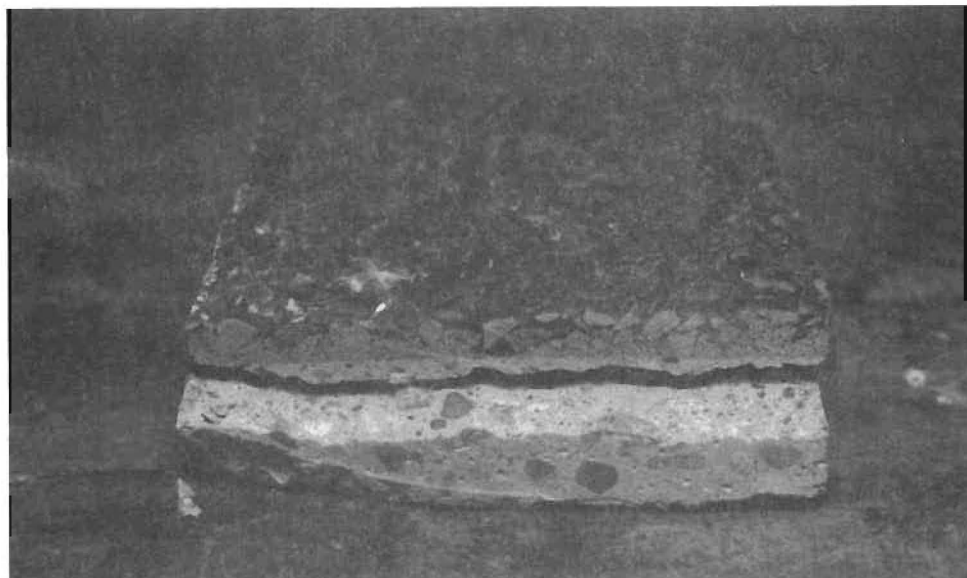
Cracks in Concrete after Shearing Test.
